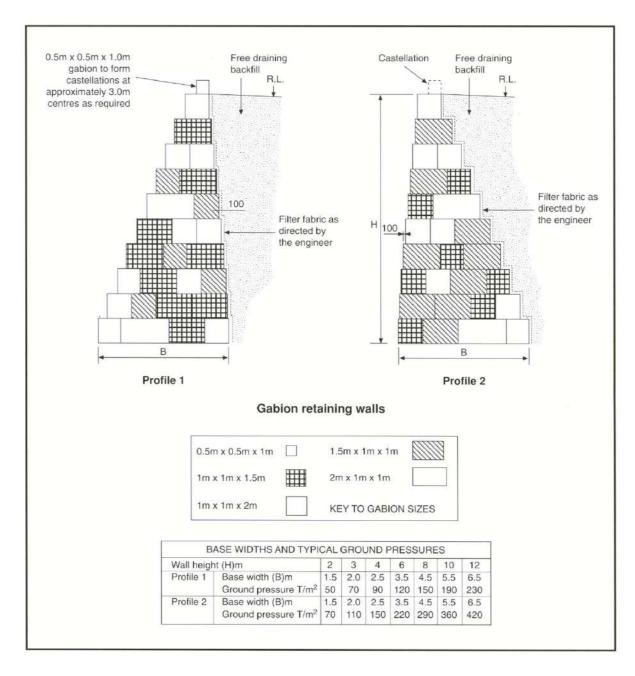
Typical details for gabion and reinforced earth retaining walls
